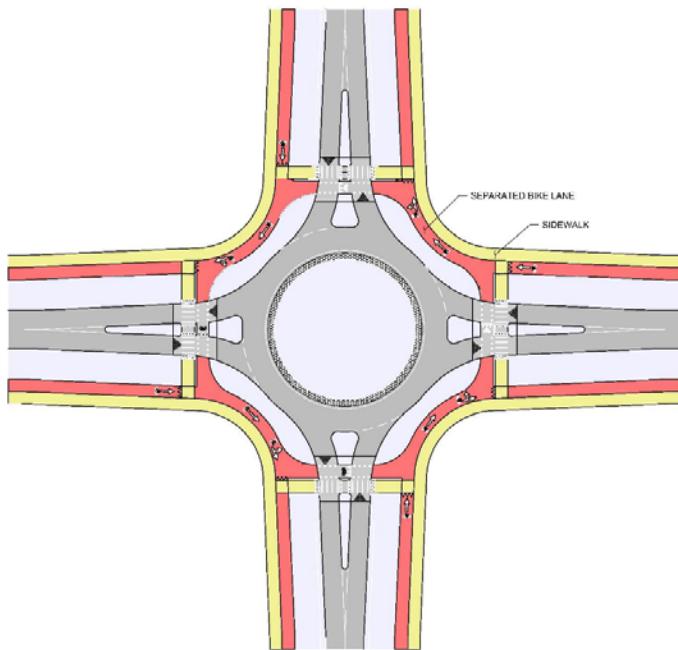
[Protected Bike Lane at Roundabout Typical Layout](#)
